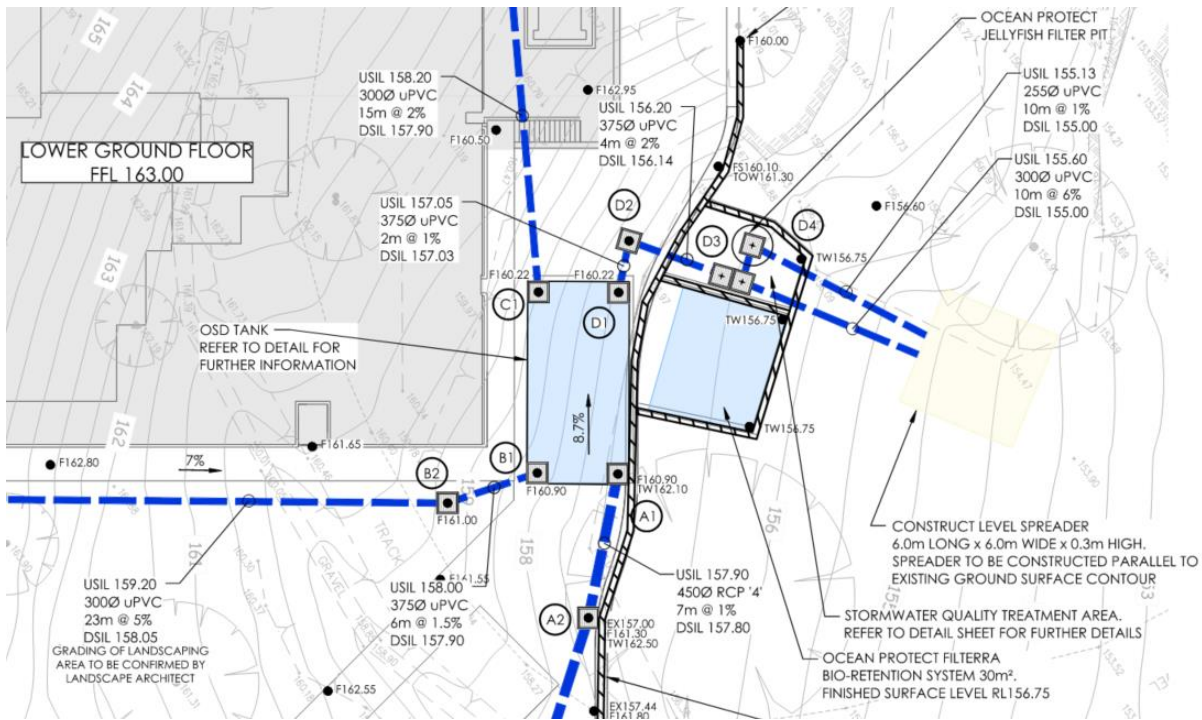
PROPOSED MODIFICATION TO OSD AND WSUD STORMWATER MANAGEMENT LAYOUT
